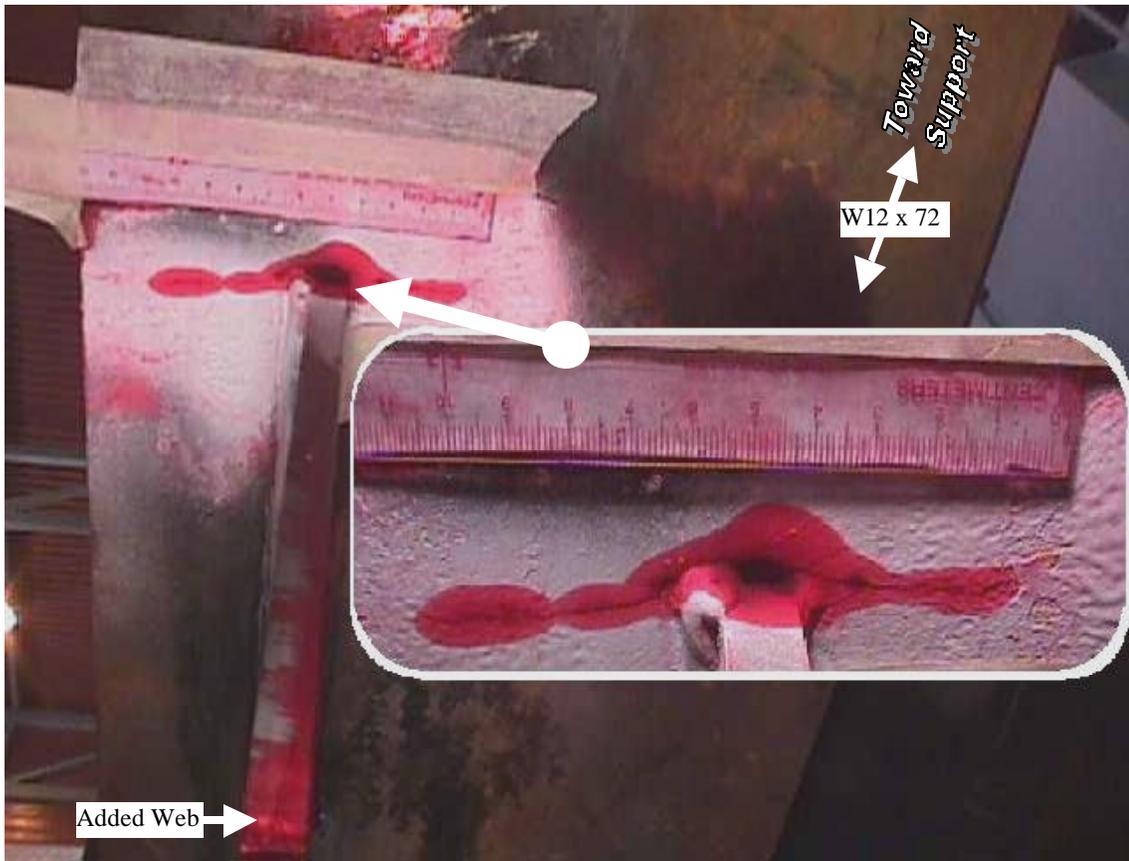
Typical crack at fillet weld termination of added web.
